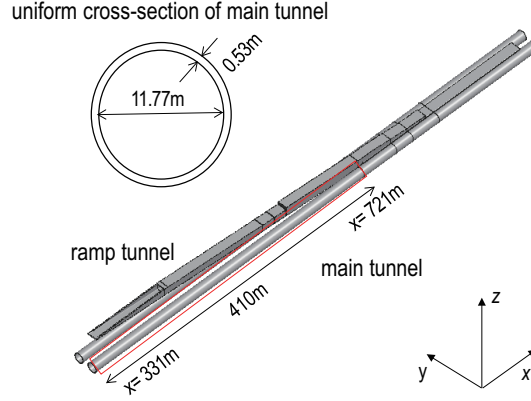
Schematic view of large scale tunnel with ramp tunnel.
